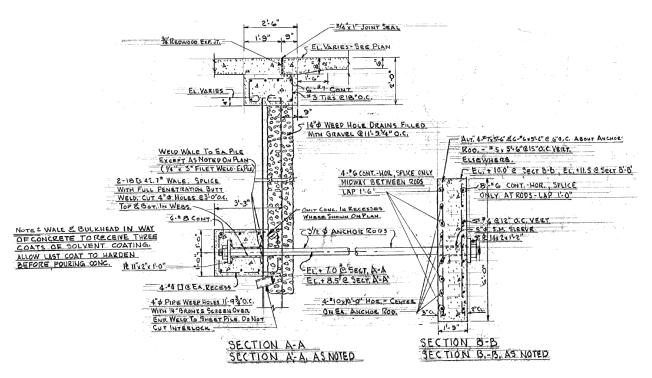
Cross-section of CD 26 through sheet piling bulkhead and anchor wall
